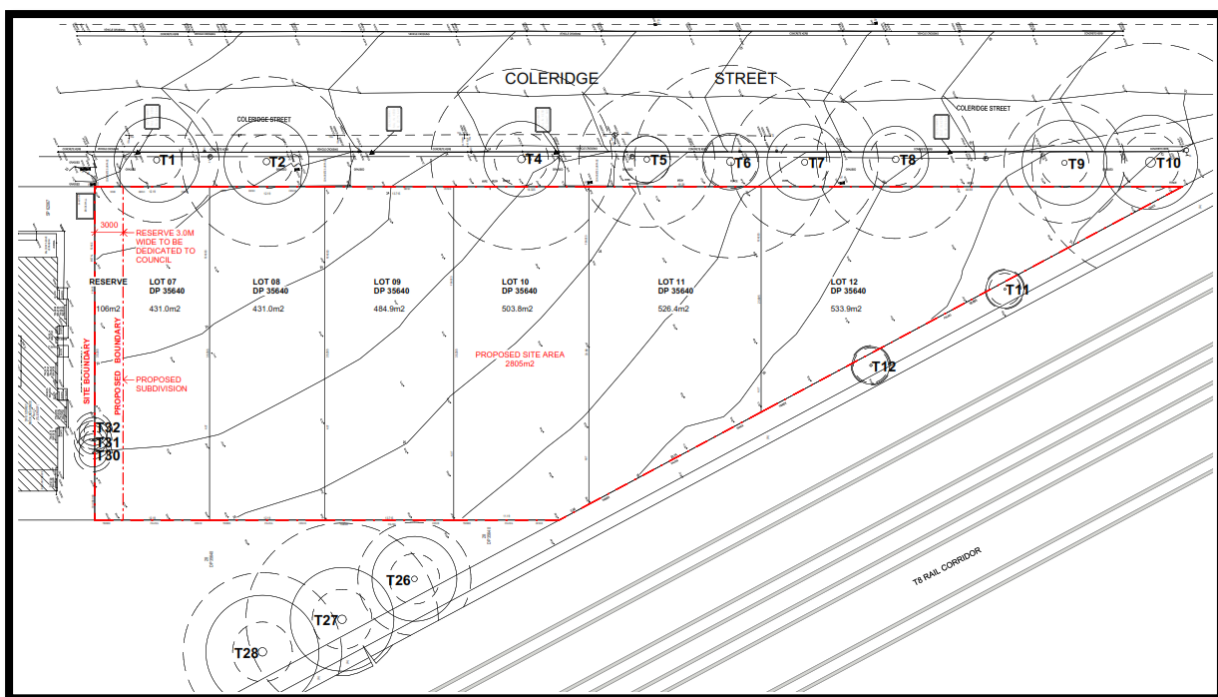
Subdivision Plan - 1-13 Coleridge Street, Riverwood
